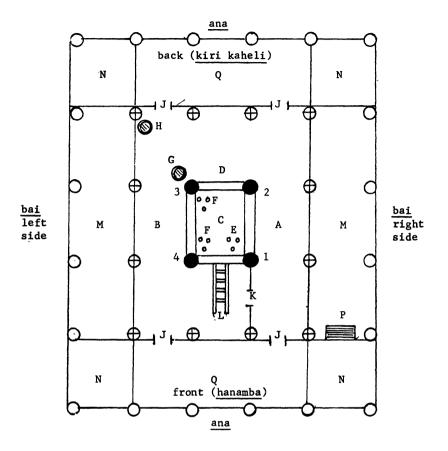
Floor Plan of an Ancestral House (Uma Marapu).
